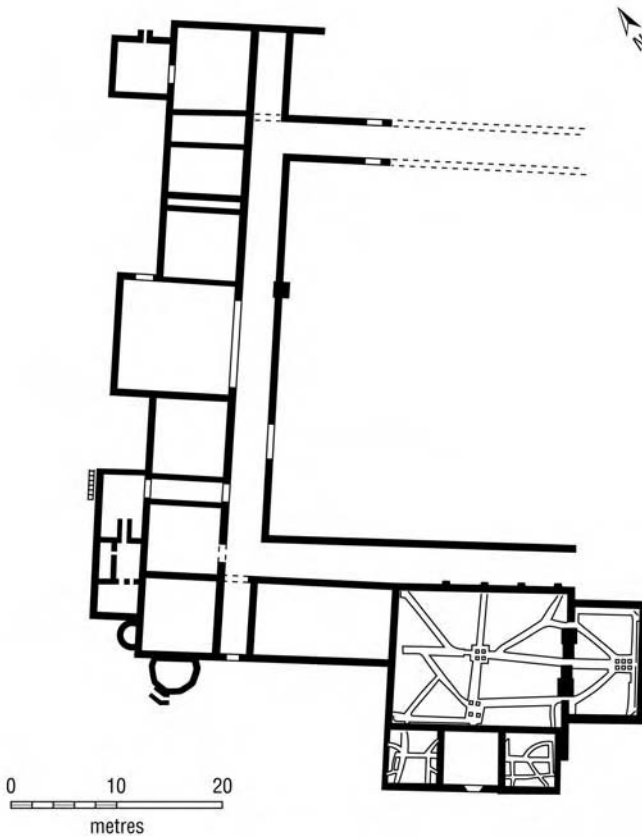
Plan of the second Coupéré building (after Sablayrolles in *Collectif* 2002)
